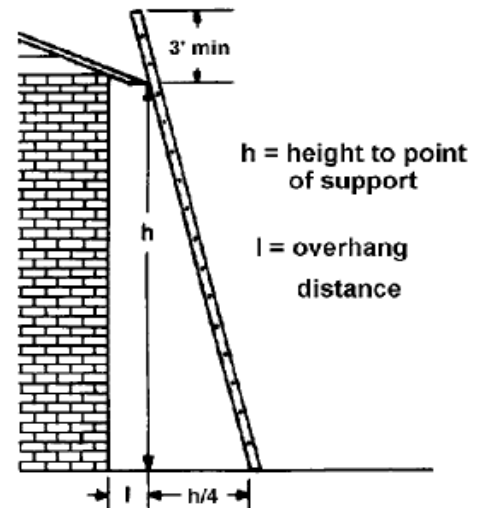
The base of a straight ladder should be one foot out of every four of height to the point of support
